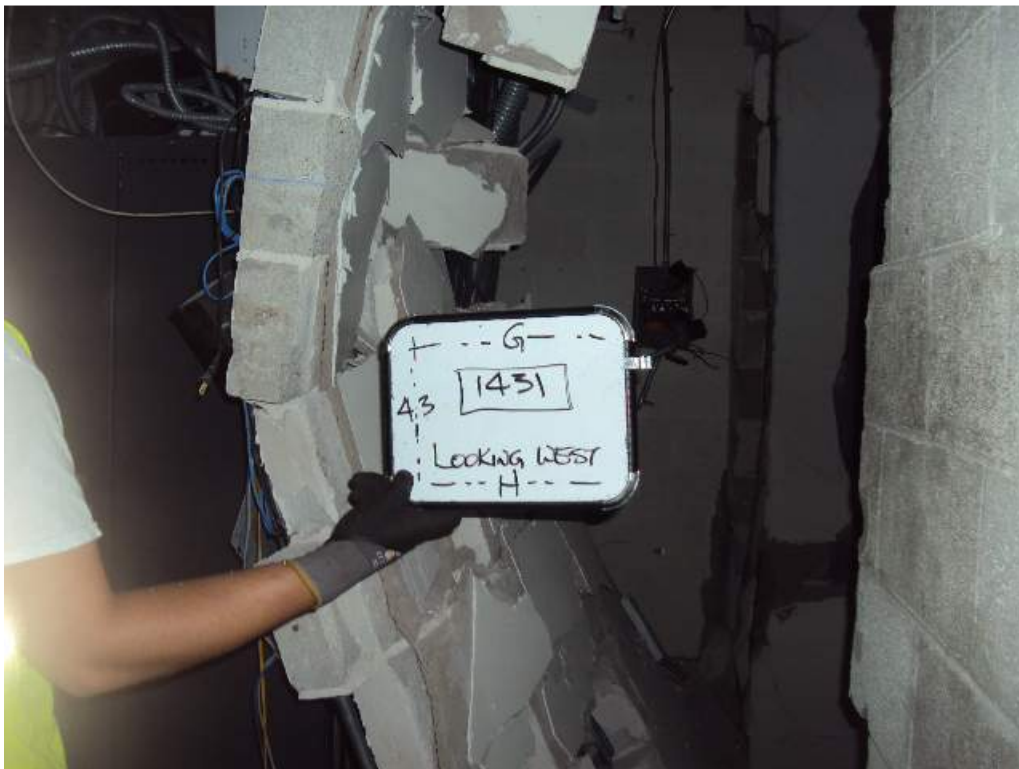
1st Floor – Room 1431– Along col line 4.3 between col lines G and H – Looking West – Collapsed CMU wall
